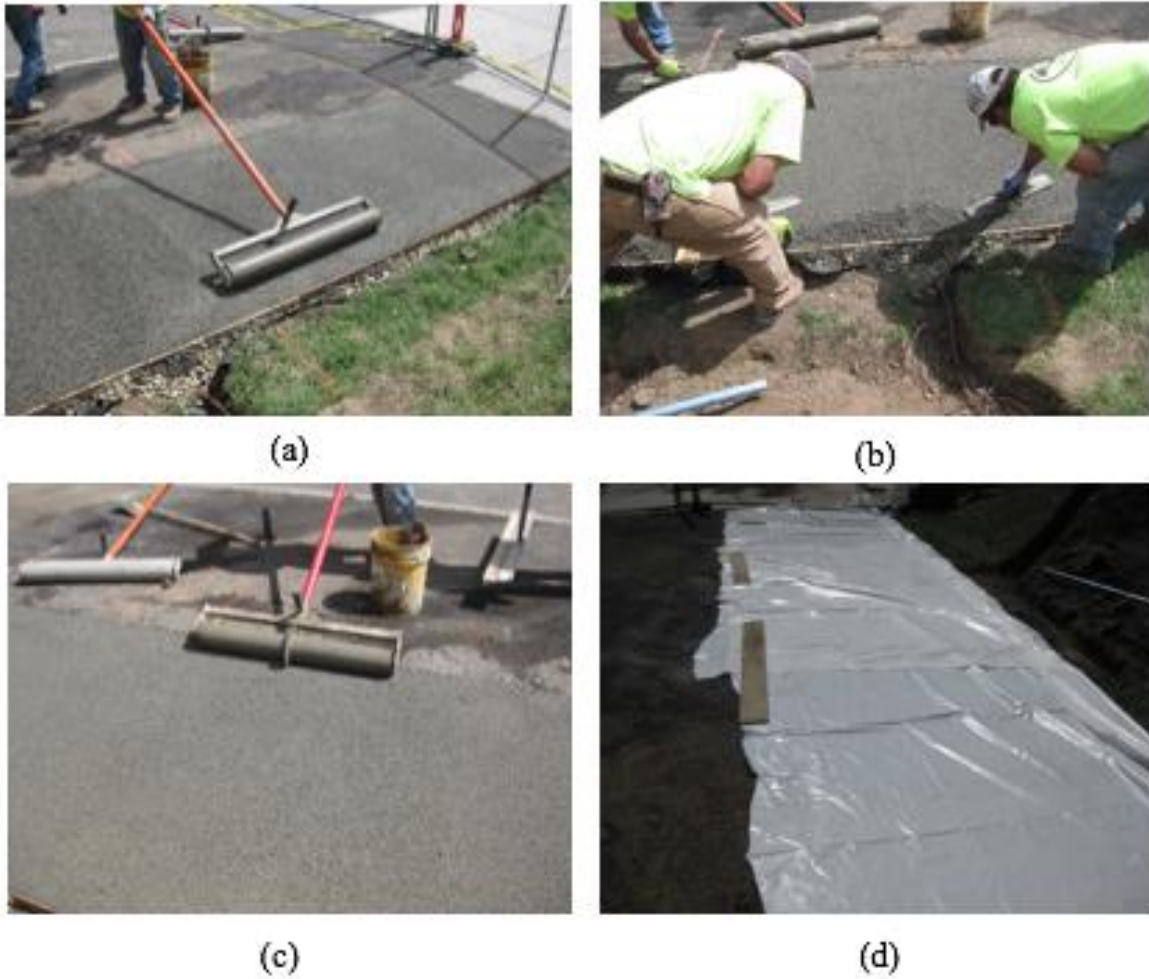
(a) Compacting PC pavement surface using a roller screed, (b) hand finishing the pavement edge, (c) cutting pavement joints with a roller joint cutter, (d) polypropylene sheet covering the PC sidewalk for curing
